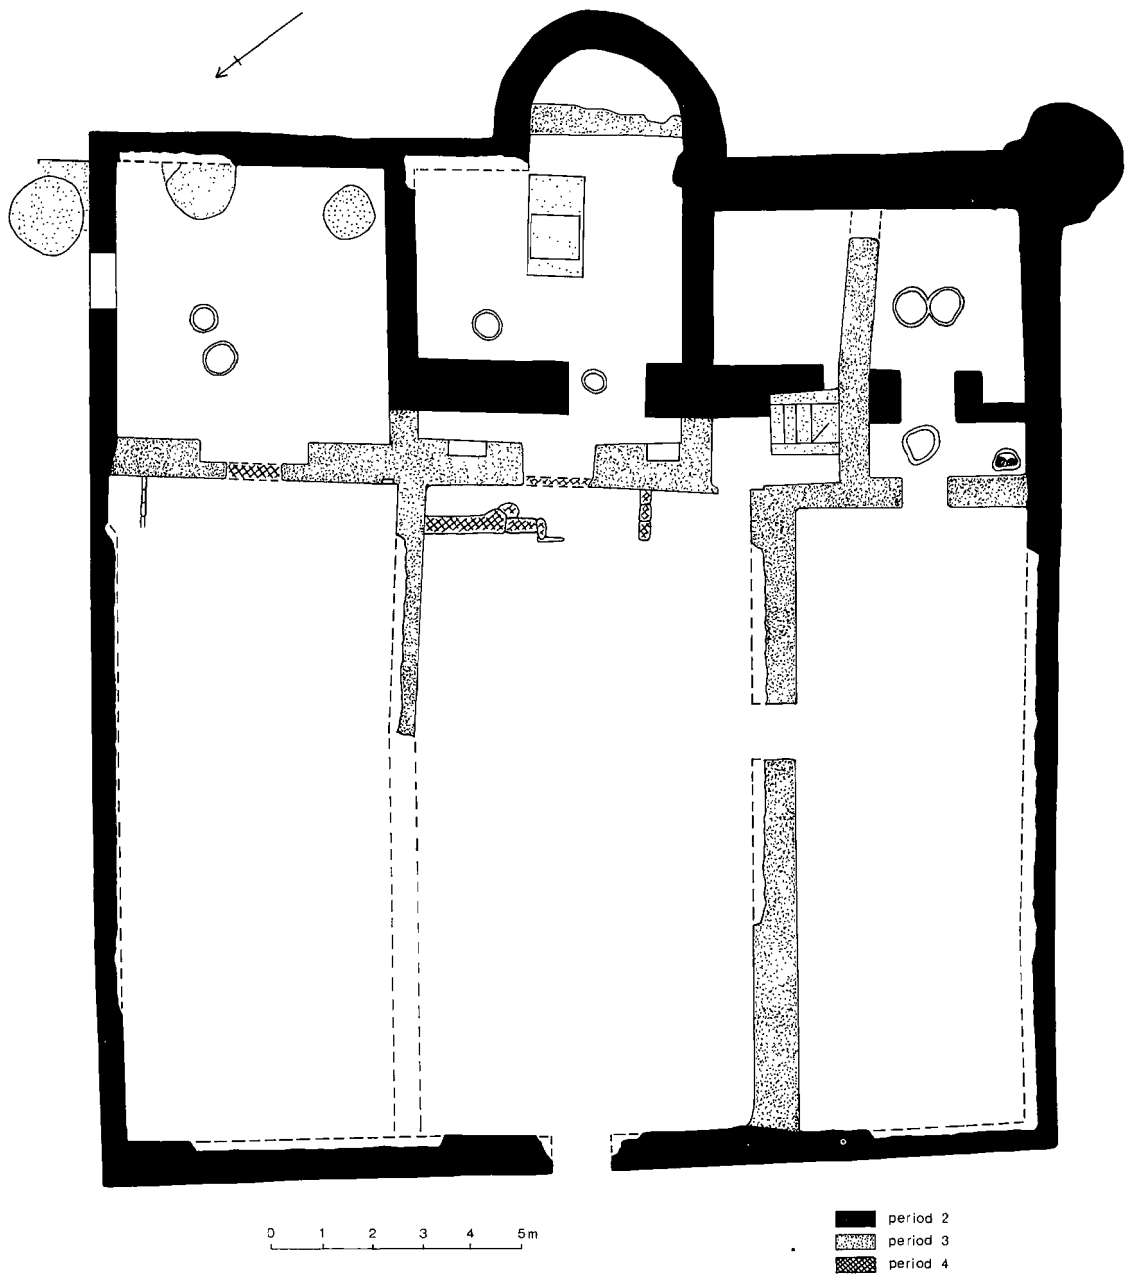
Plan of the excavated building at Khirbet Deir Situn. Drawing by J.E. Curtis.
